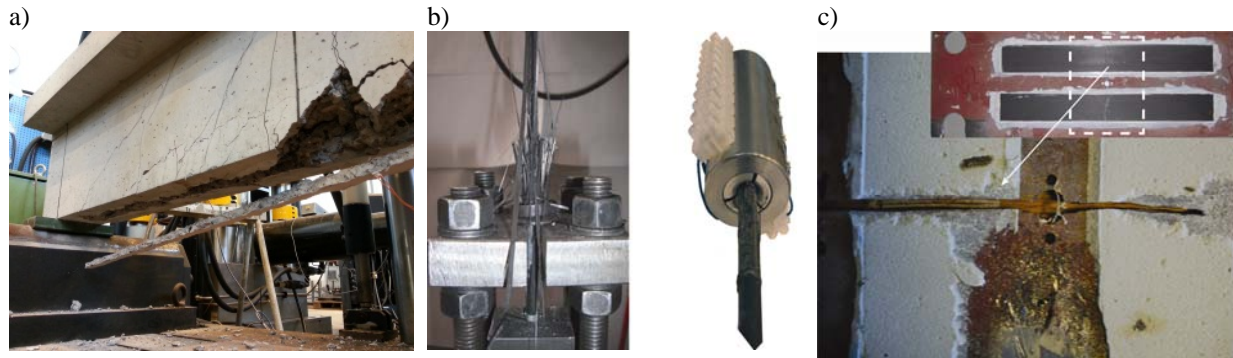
a) Failure of CFRP NSMR failure in concrete beam, b) Slippage in mechanical anchorage used for CFRP rods, c) Adhesive de-bonding between steel and CFRP laminate.
